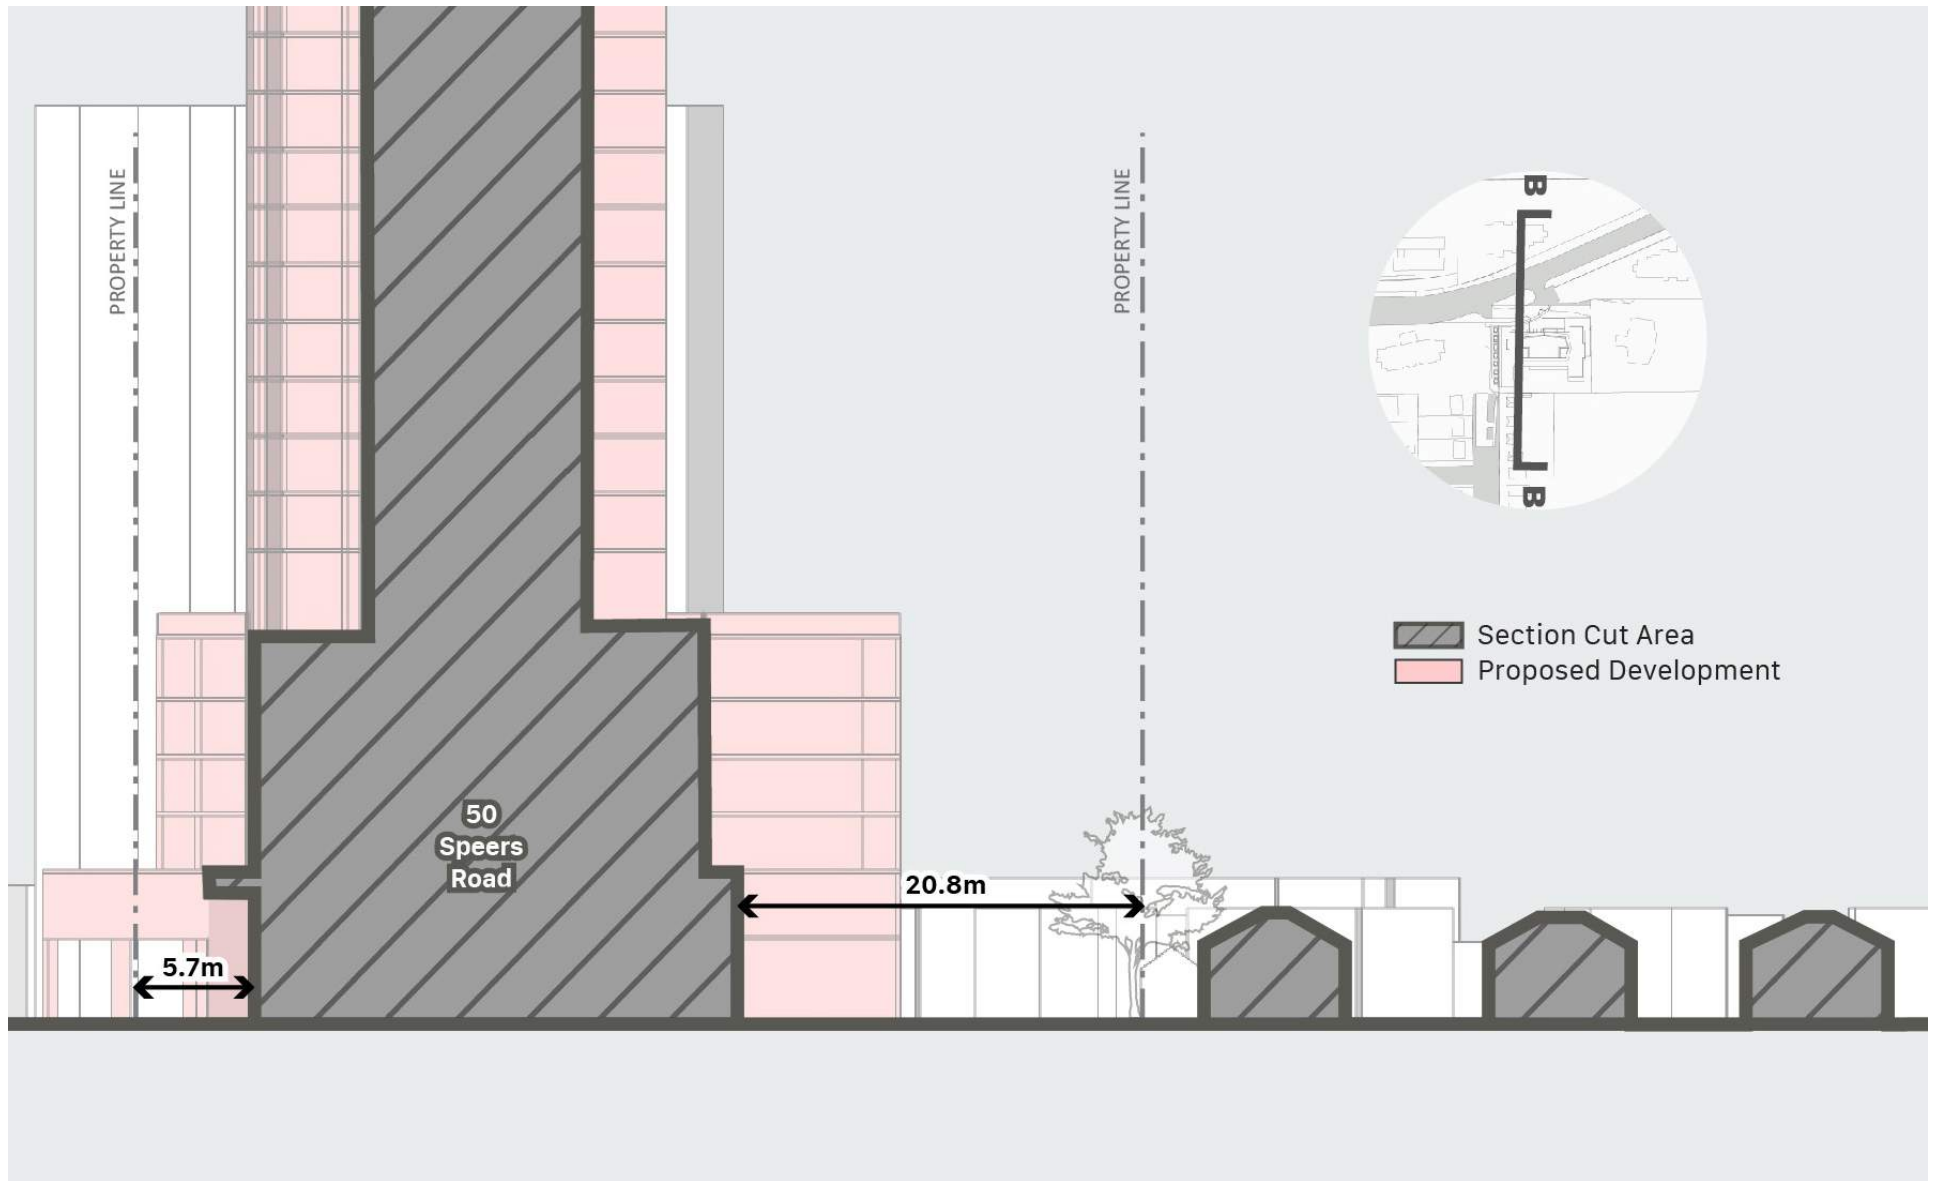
Section BB - Transition to Adjacent Uses (Proposed Condition)
